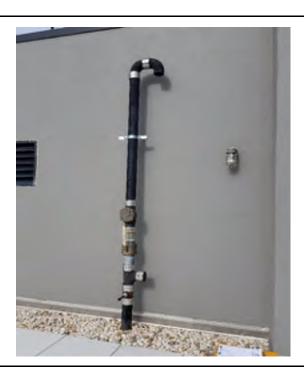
V2 riser and sample port in good condition, facing northeast. 27 February 2019.
